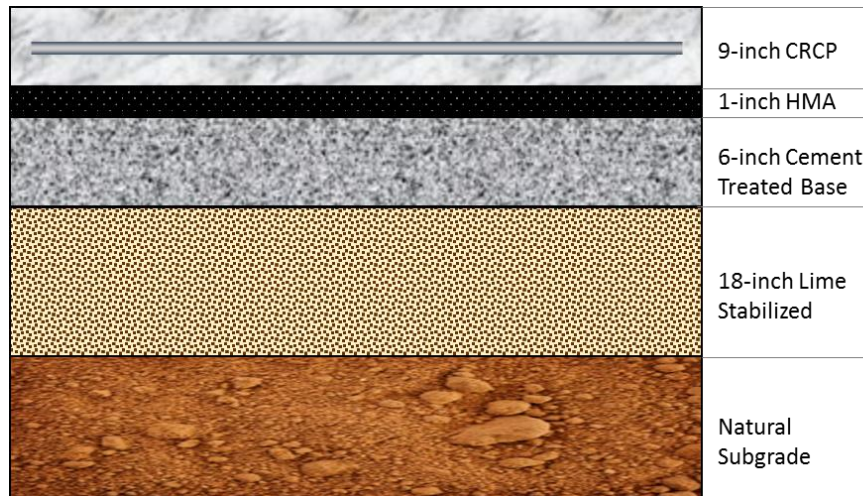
Base Case CRCP Pavement Design Structure.⁶²
